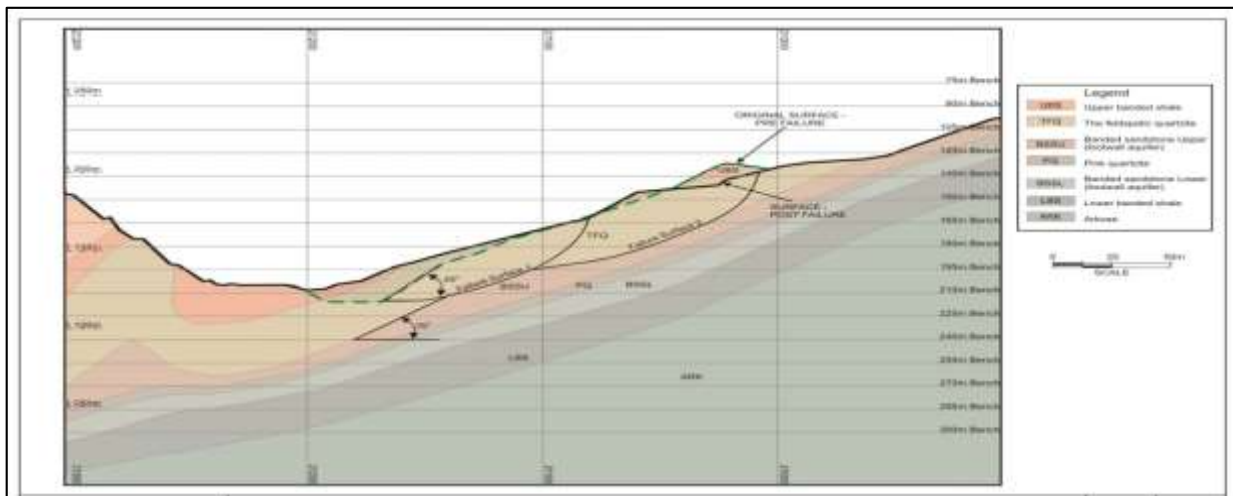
Two phase failure mechanism of Nchanga Open Pit Foot wall slope (Terbrugge, 2015)
